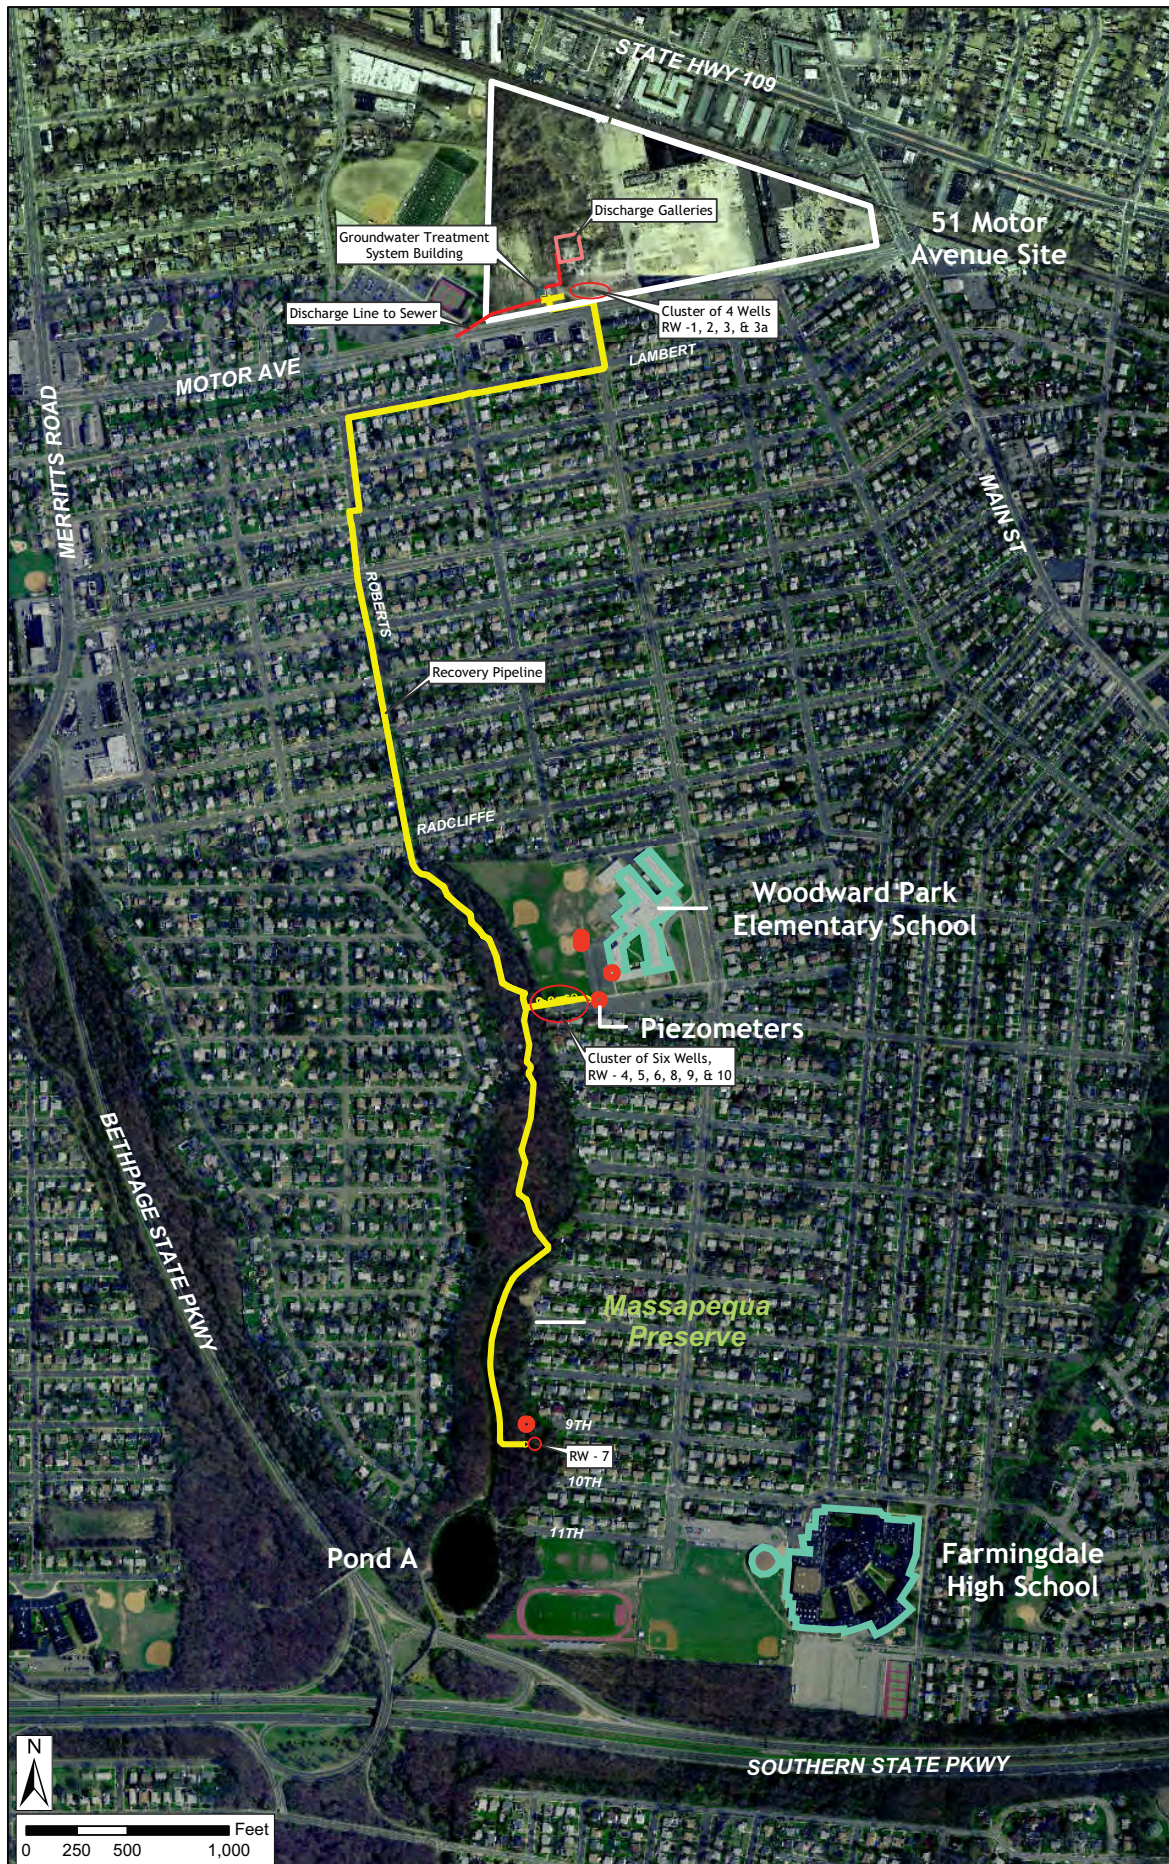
Groundwater Remediation System's On-Site and Off-Site Construction Activities Layout
